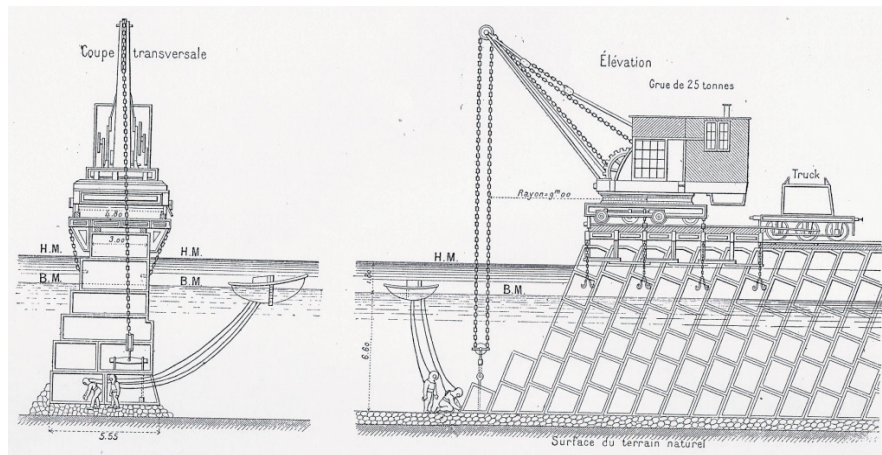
Placing of a sloping bond block wall 1870 [Rochemont and Desprez 1900]
